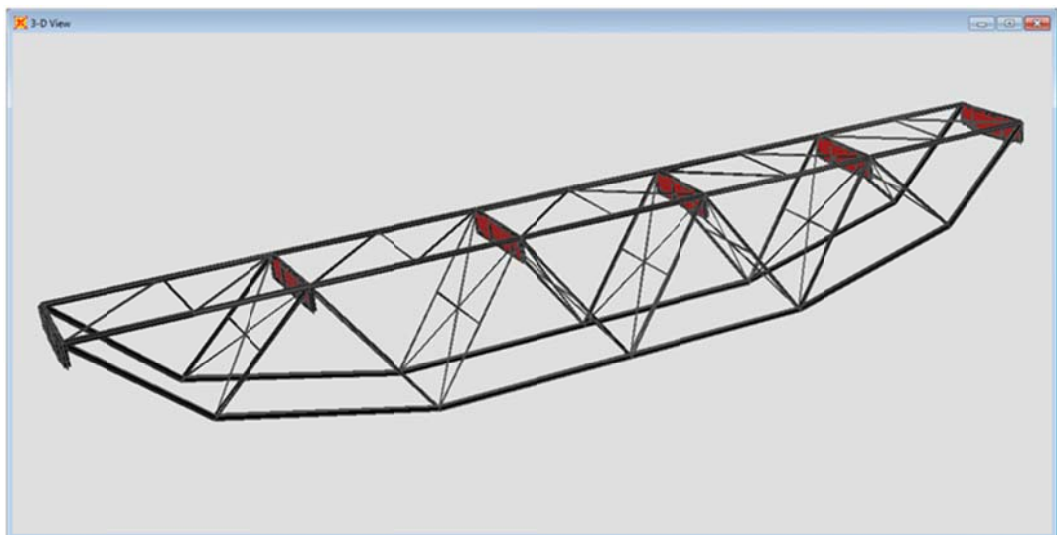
FEM truss members, lateral and vertical bracing and floor beams
